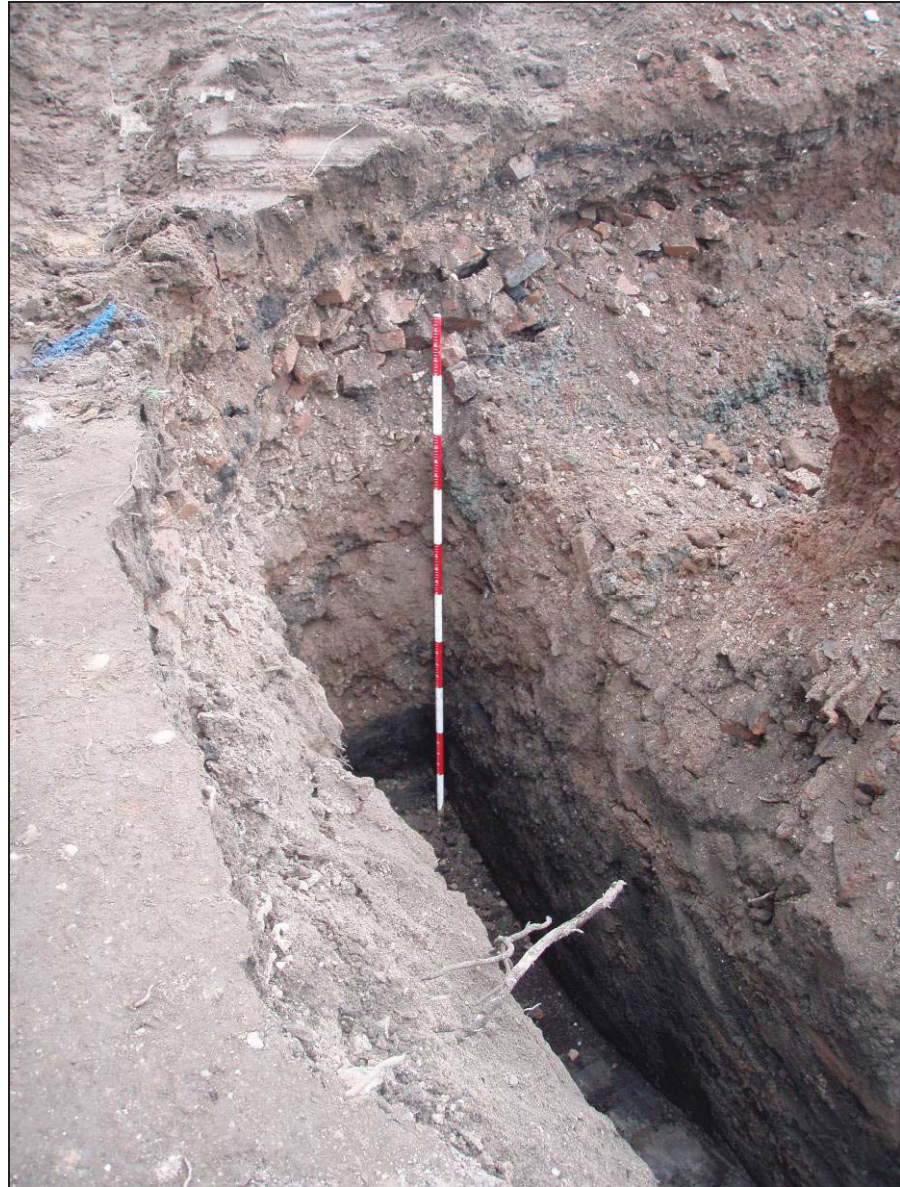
Oblique view of south facing section of most southerly foundation trench showing level of made ground and organic deposits.
